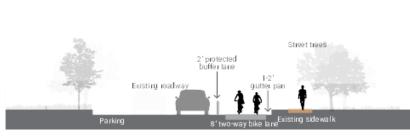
Fergus Falls GET: On-Road One-Side Typical Section
